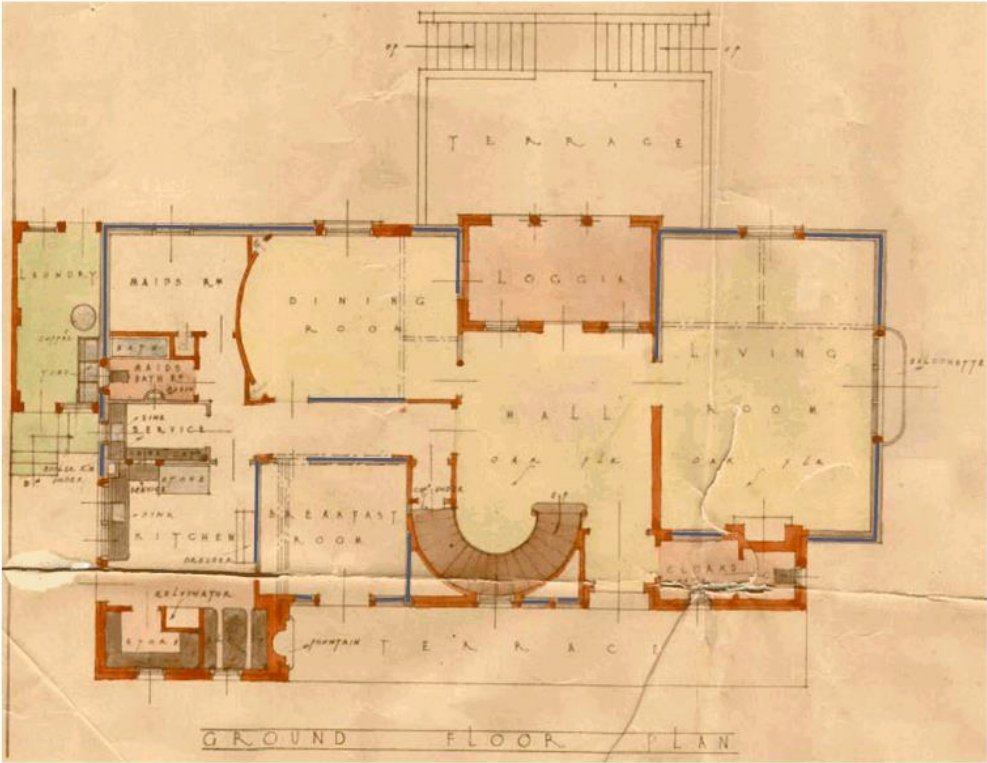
Ground floor plan of the Gilling Scheme, 1928. Note the grey walls indicating existing fabric retained from the Stanfield scheme.
